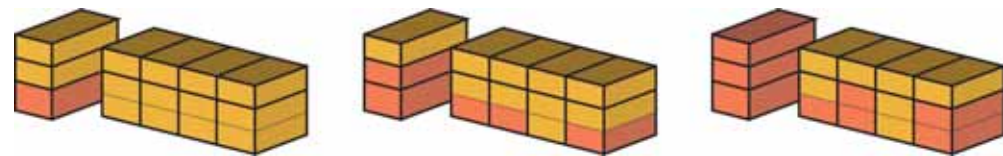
Elevated Commercial Development (Over 5'-0").
